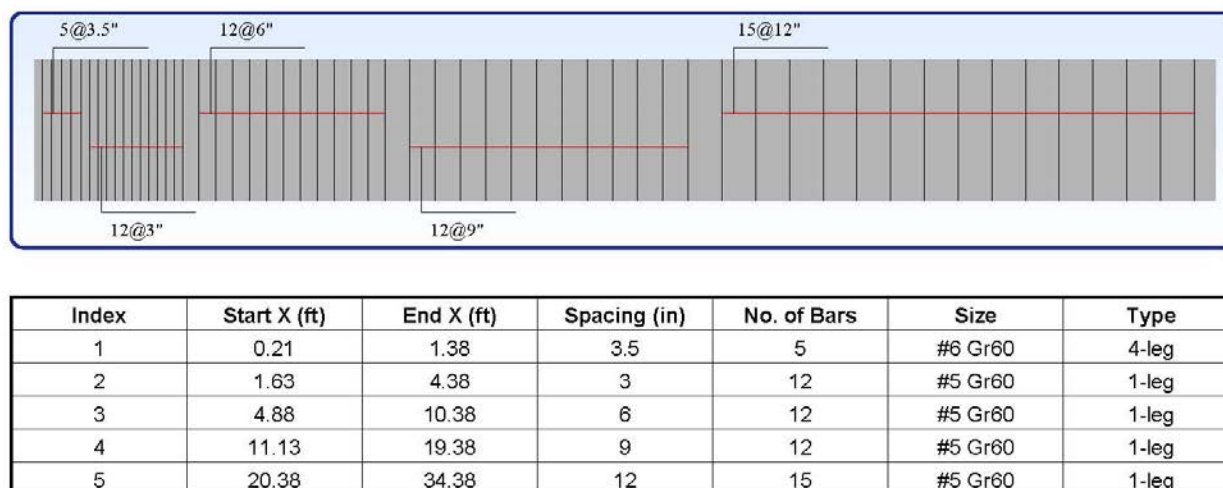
Shear reinforcement layout used in SmartBridge models
